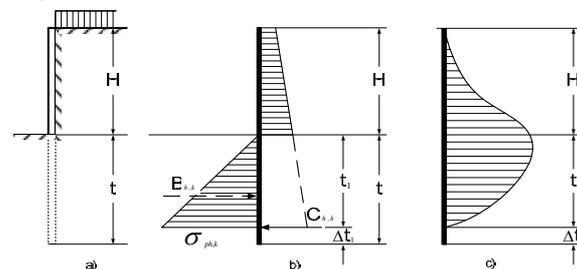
SPW without lateral support: (a) initial excavation, (b) lateral pressures and forces diagram and (c) bending moments diagram (EAB 2008)
